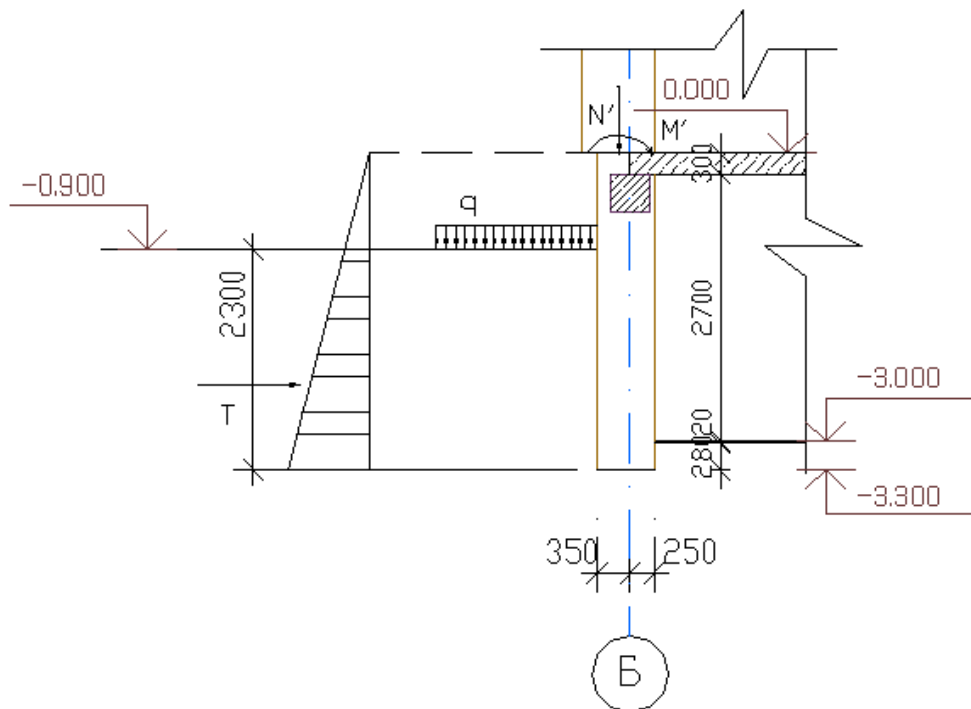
Calculation diagram of the off-center loaded foundation
